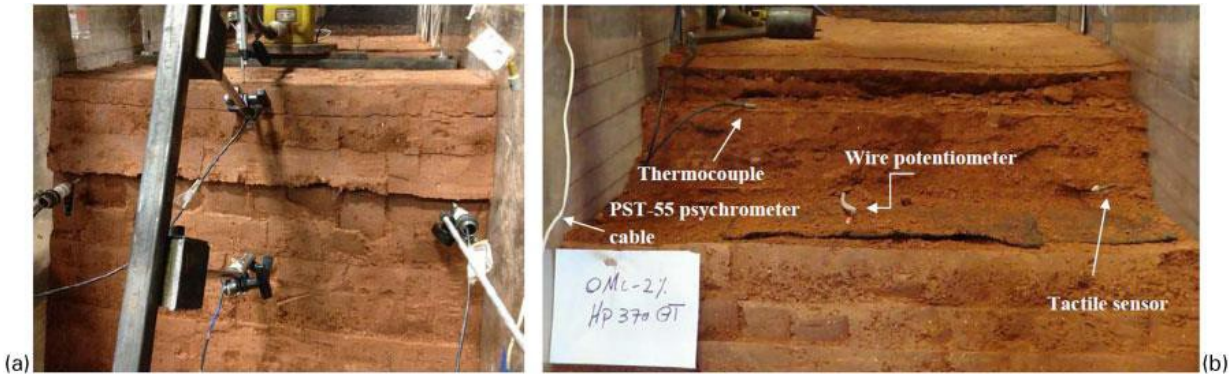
Reduced-scale indoor model embankments after surcharge load testing and excavation
